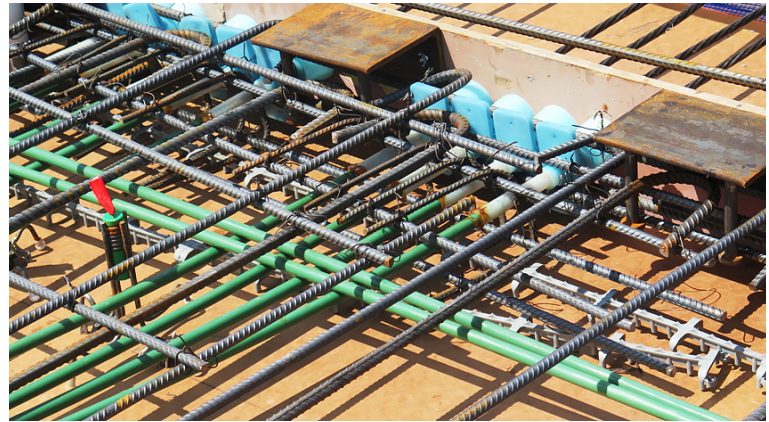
Structural designers must coordinate embedded plates, anchors, reinforcing bars and PT systems. (Image courtesy of Ceco Concrete Construction.)
